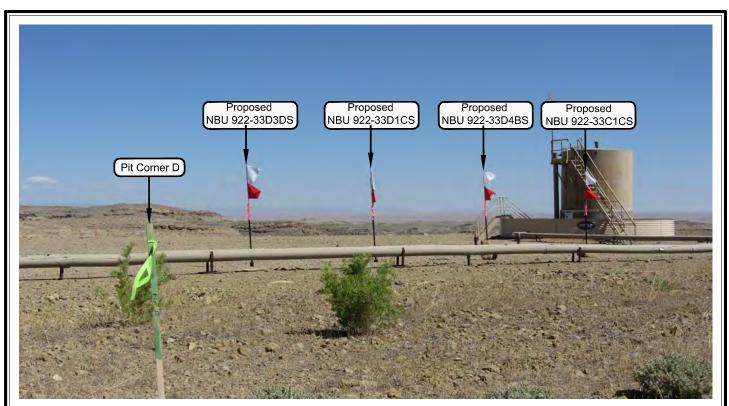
PHOTO VIEW: FROM PIT CORNER D TO LOCATION STAKE
